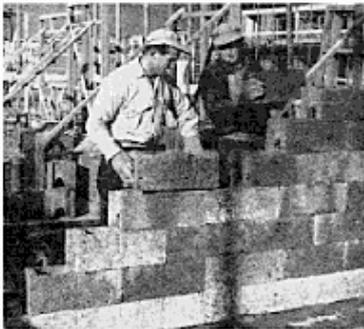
Dry stacking of Muwi building blocks (5) Figure 8: typical look of an early post-war building block completed in the Muwi building system with visible belt courses (14)
